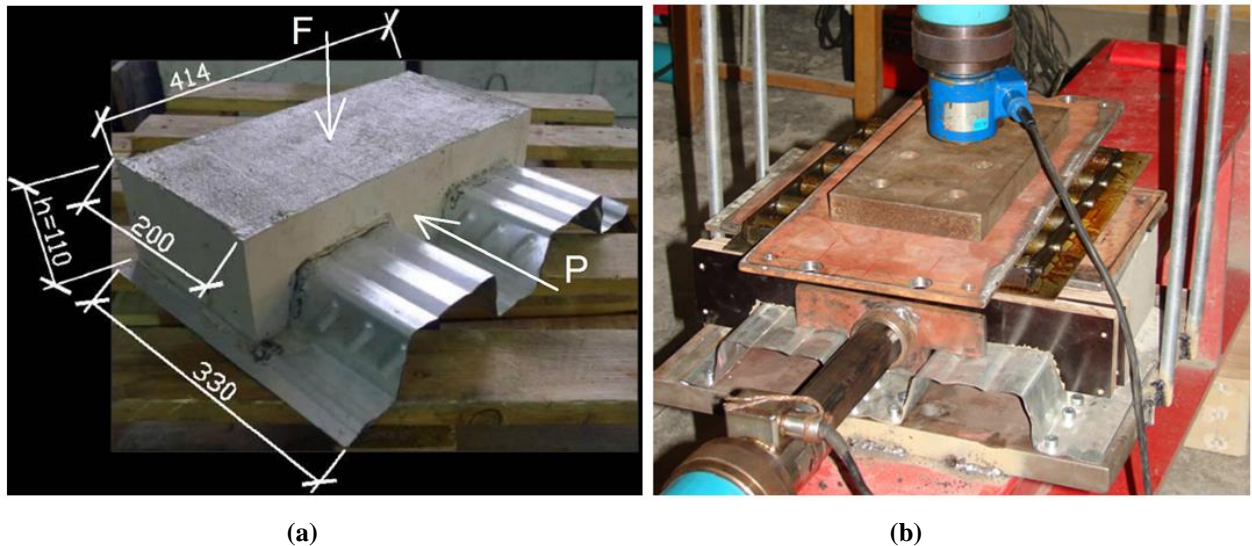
(a) Specimens dimensions (b) roller bearing placed on the top of the concrete block [3].
